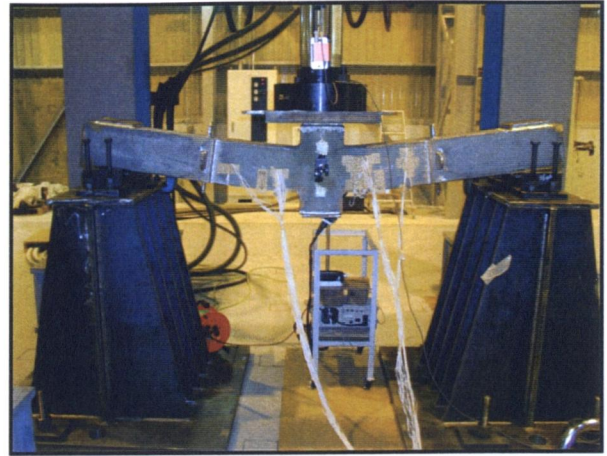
Cyclic loading test in 3-point bending for beam-to-column connection in steel pier.
